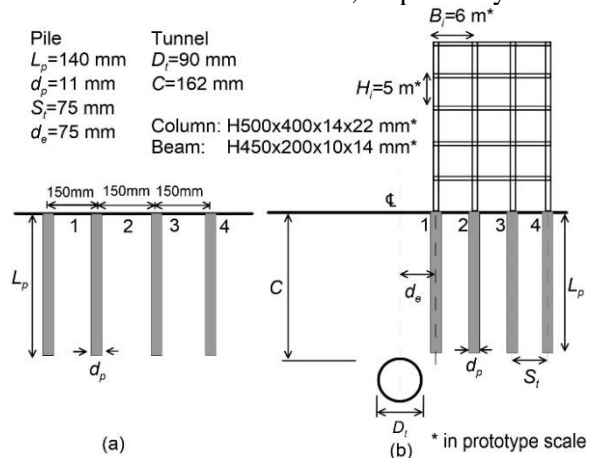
Test layout: (a) pile loading test, and (b) tunnelling beneath piled frame (model scale)
